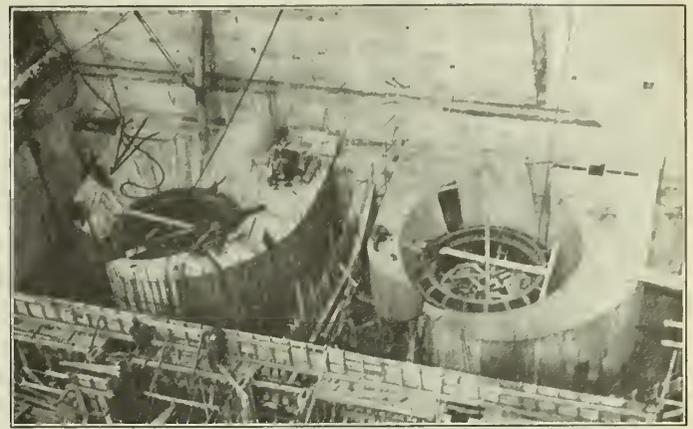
Power House Substructure showing Forms for Concrete Spiral Scroll Case.
